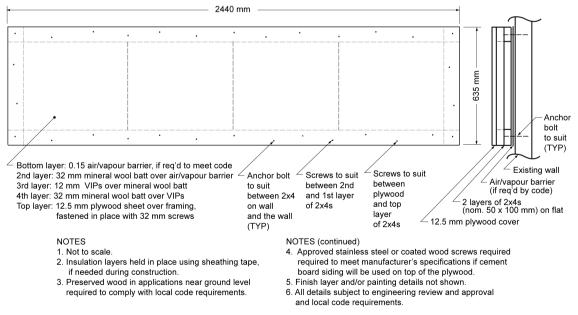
Detail of Vacuum Insulation Panel (VIP) insulation to add RSI 5.5 nominal to an existing wall.
